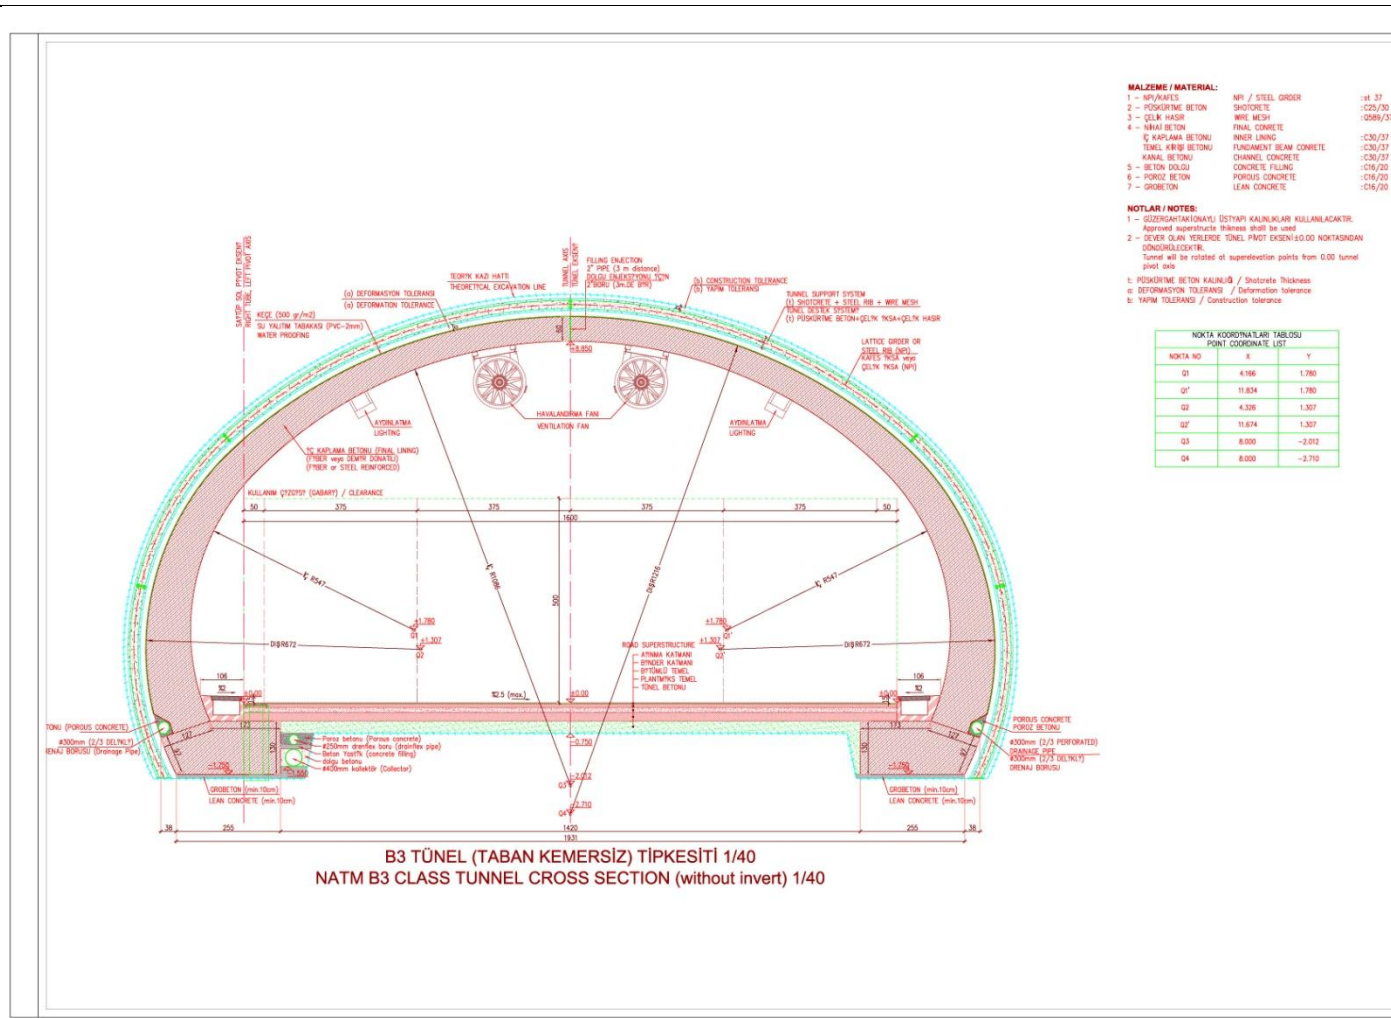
Typical Cross-section for the Tunnels (1/3)
